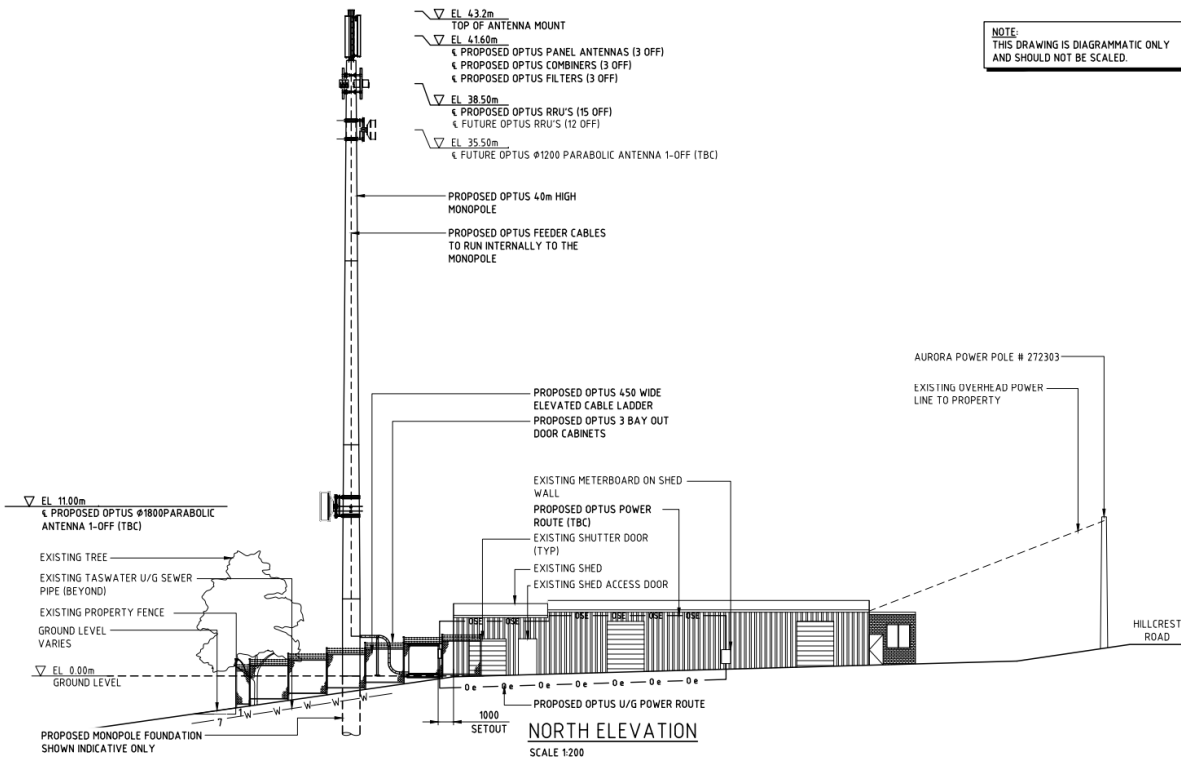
Proposed telecommunications infrastructure elevation plan (Source: DCC – PA2016.0162 - Daly International (2016)).
